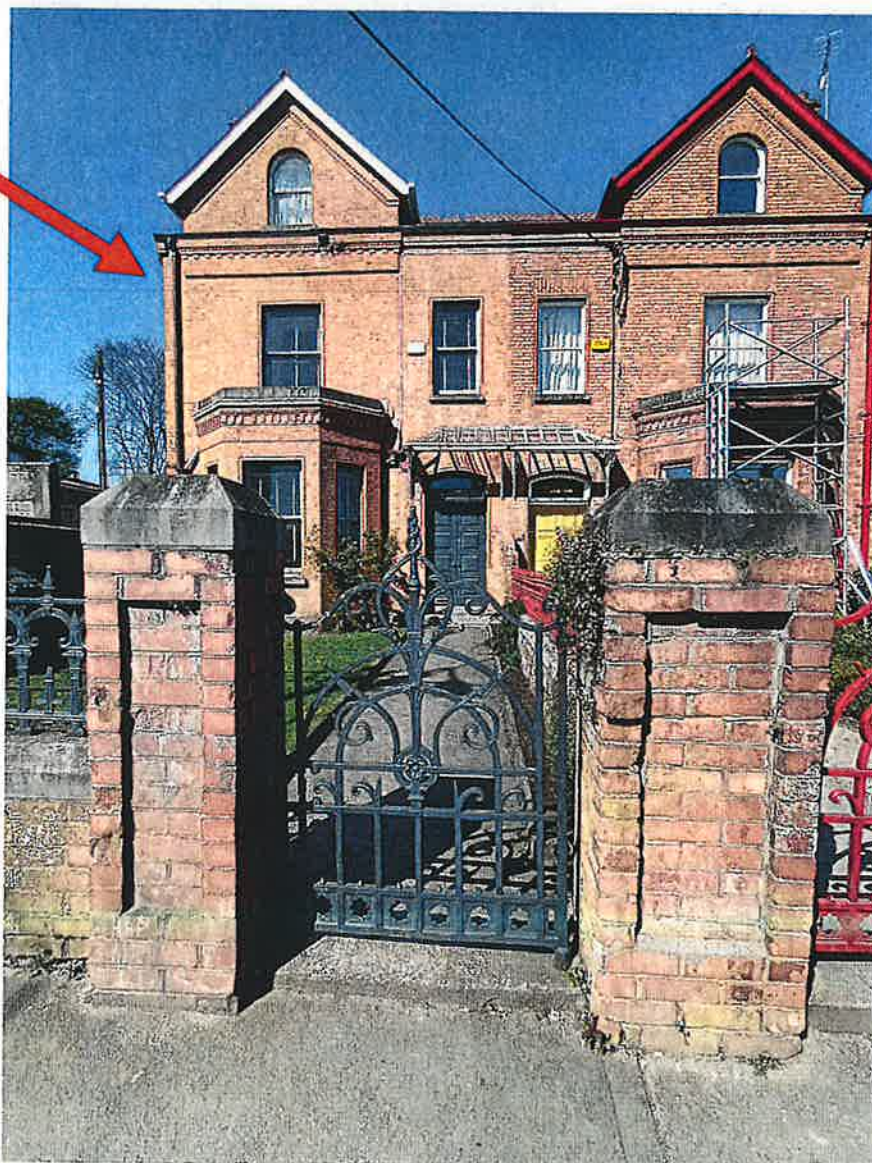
Front Façade – Aras Mhuire – denoted by red arrow
